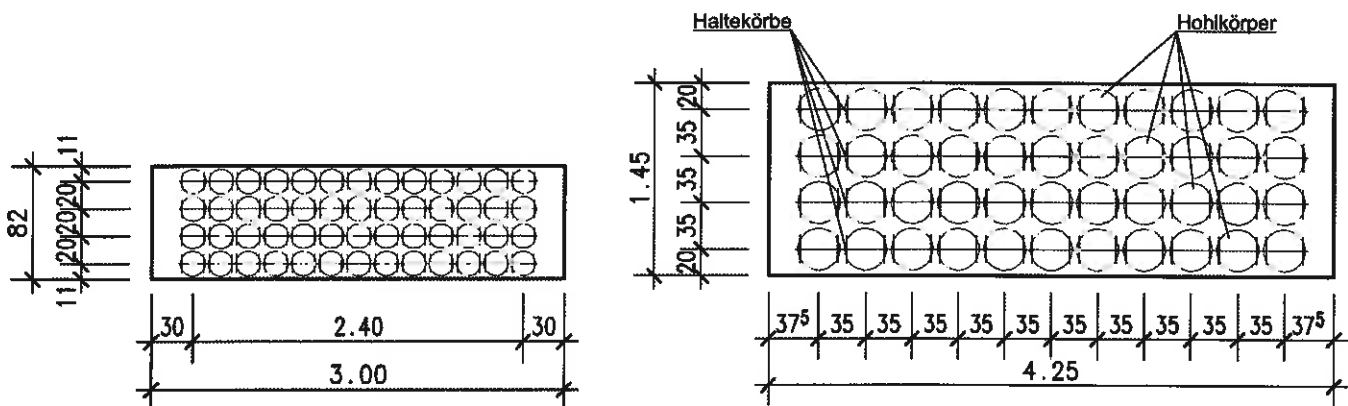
Specimen ground plans of the first (left) and second (right) test series with marked cage modules
